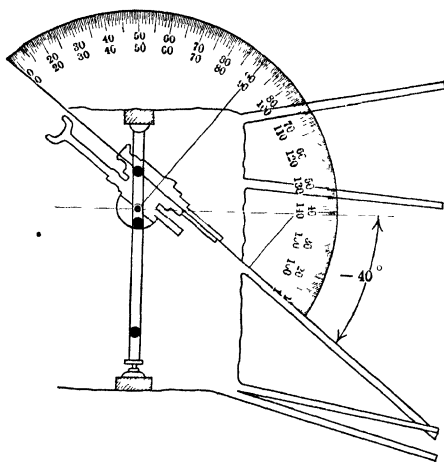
CELLULOID PROTRACTOR USED IN LAYING OUT DRILL ROUNDS.
